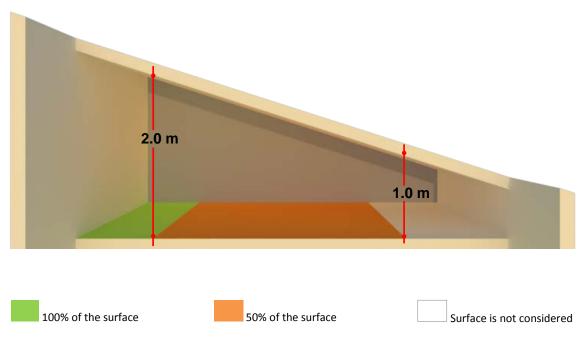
Example of areas to be considered for the ERS calculation in areas under a sloped ceiling (Source: Infonavit/Albarrán)
